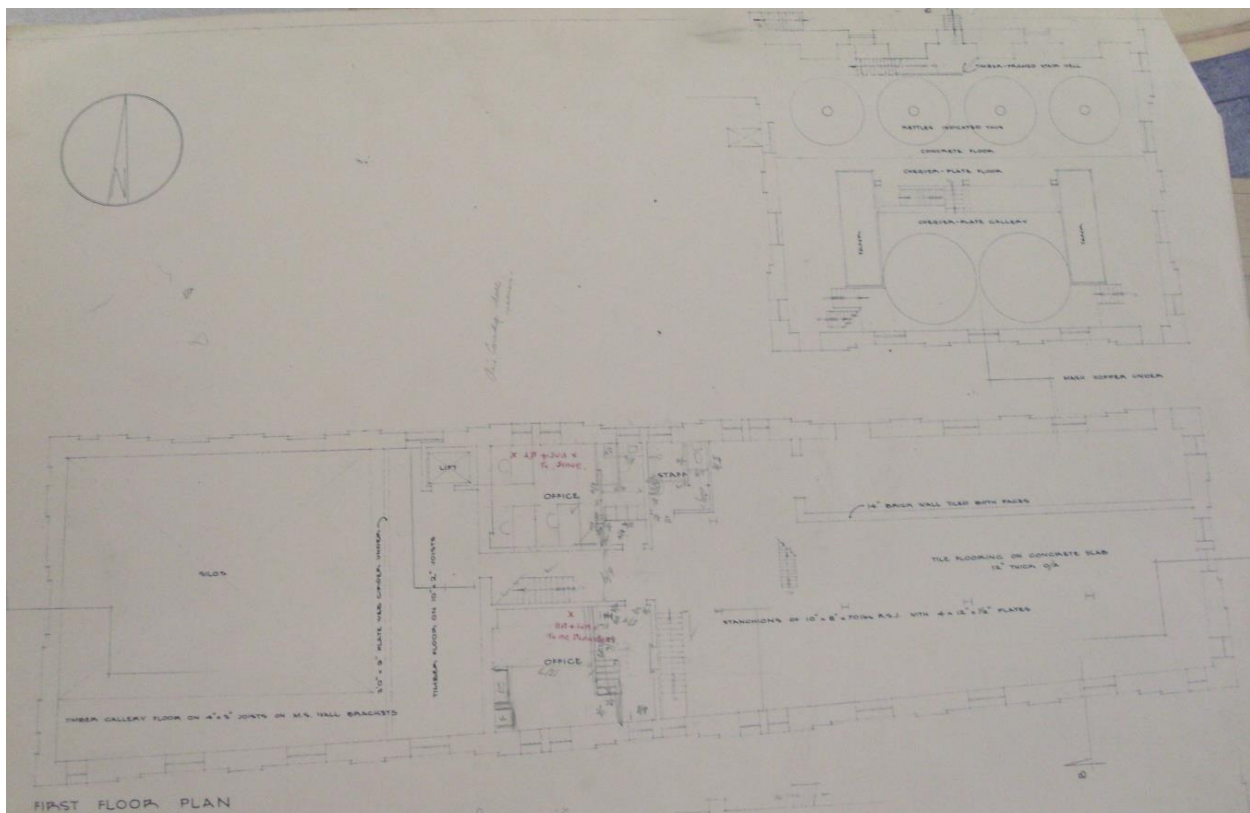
Plan drawings showing windows of Irving Street Brewery buildings: First floor plan by Lemont Niblett and Daubney, Drawing No. 4E-852A dated 27-07-54
